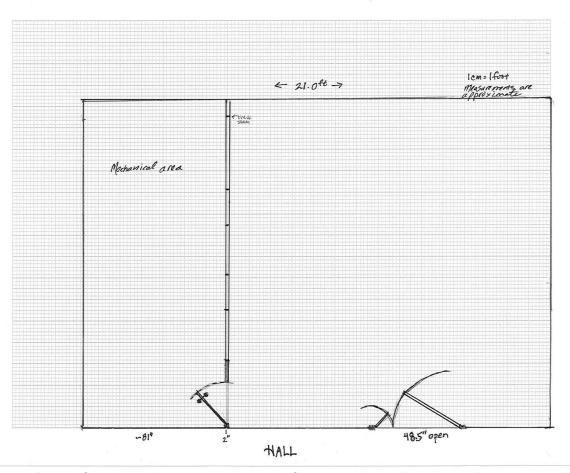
Rough floor plan showing the location of doors and the divider wall. Dimensions \sim 21 feet x 15.33 feet
